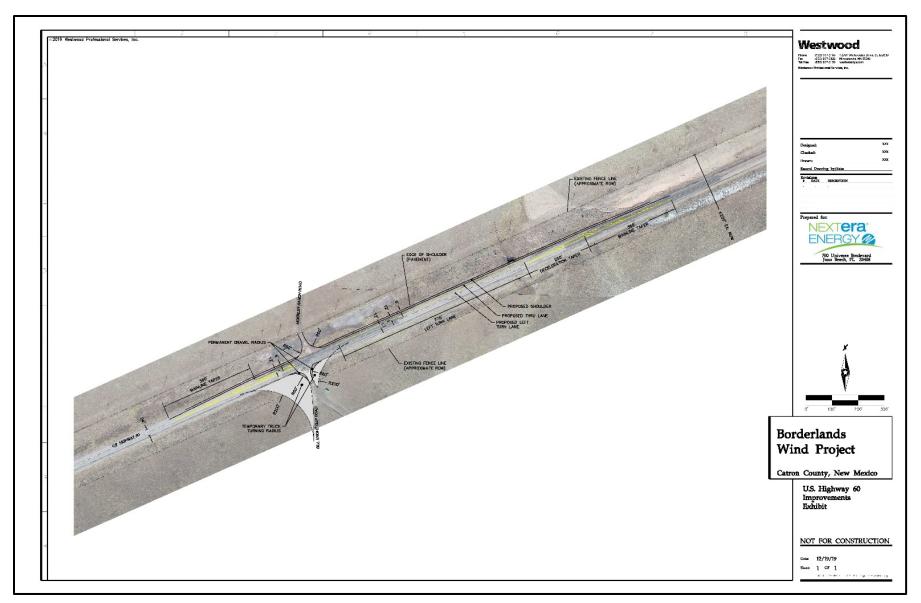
Proposed U.S. 60 and Bill Knight Gap Road intersection improvement.
